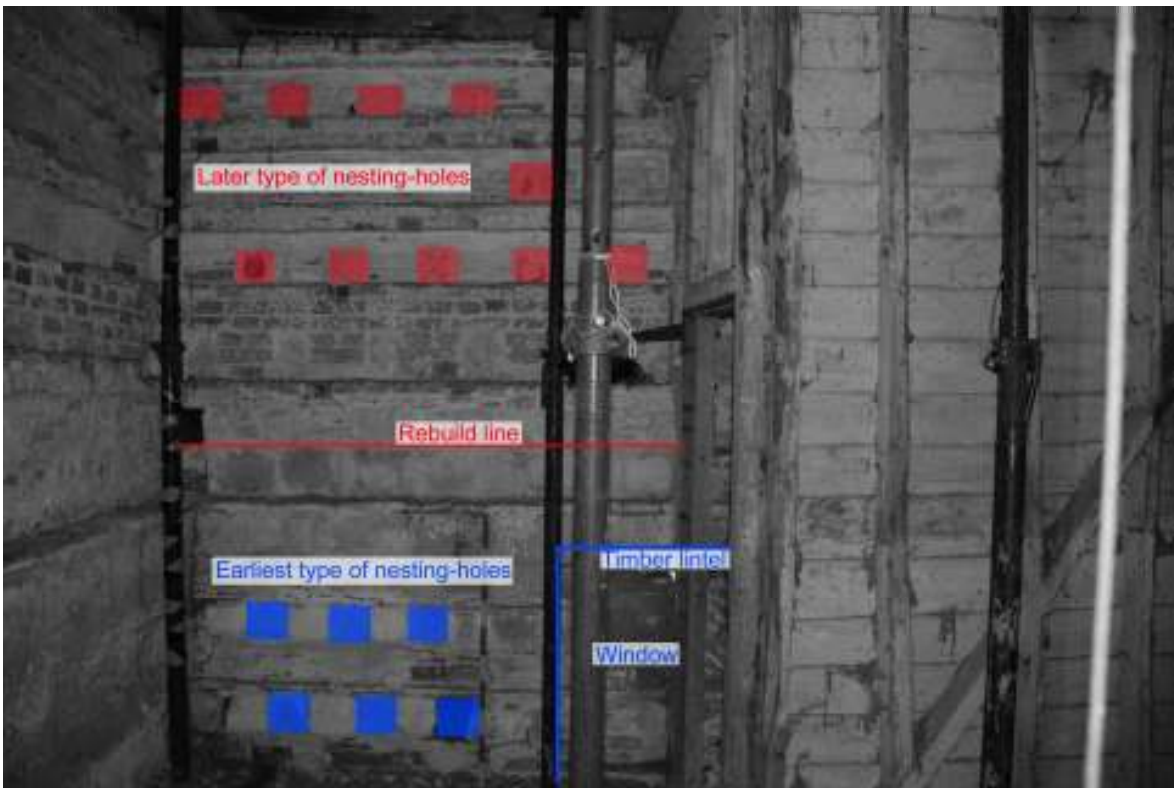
Annotated photograph of the interior southern wall – first floor. This shows the earlier construction (in blue – windows and nesting-holes); rebuild line and later construction (in red). The location of some of the blocked nesting-holes are highlighted.
